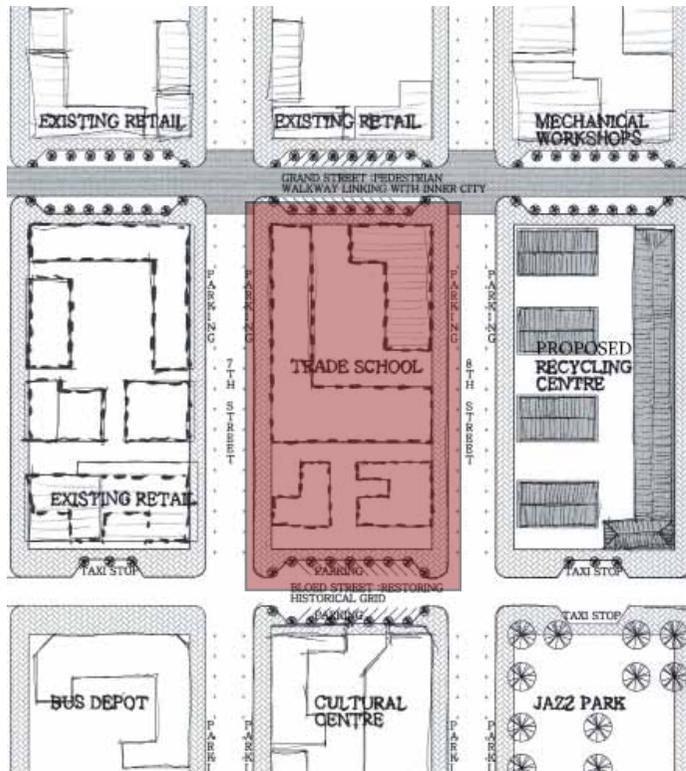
Site Plan with Urban Framework Layer (Author, 2010).
